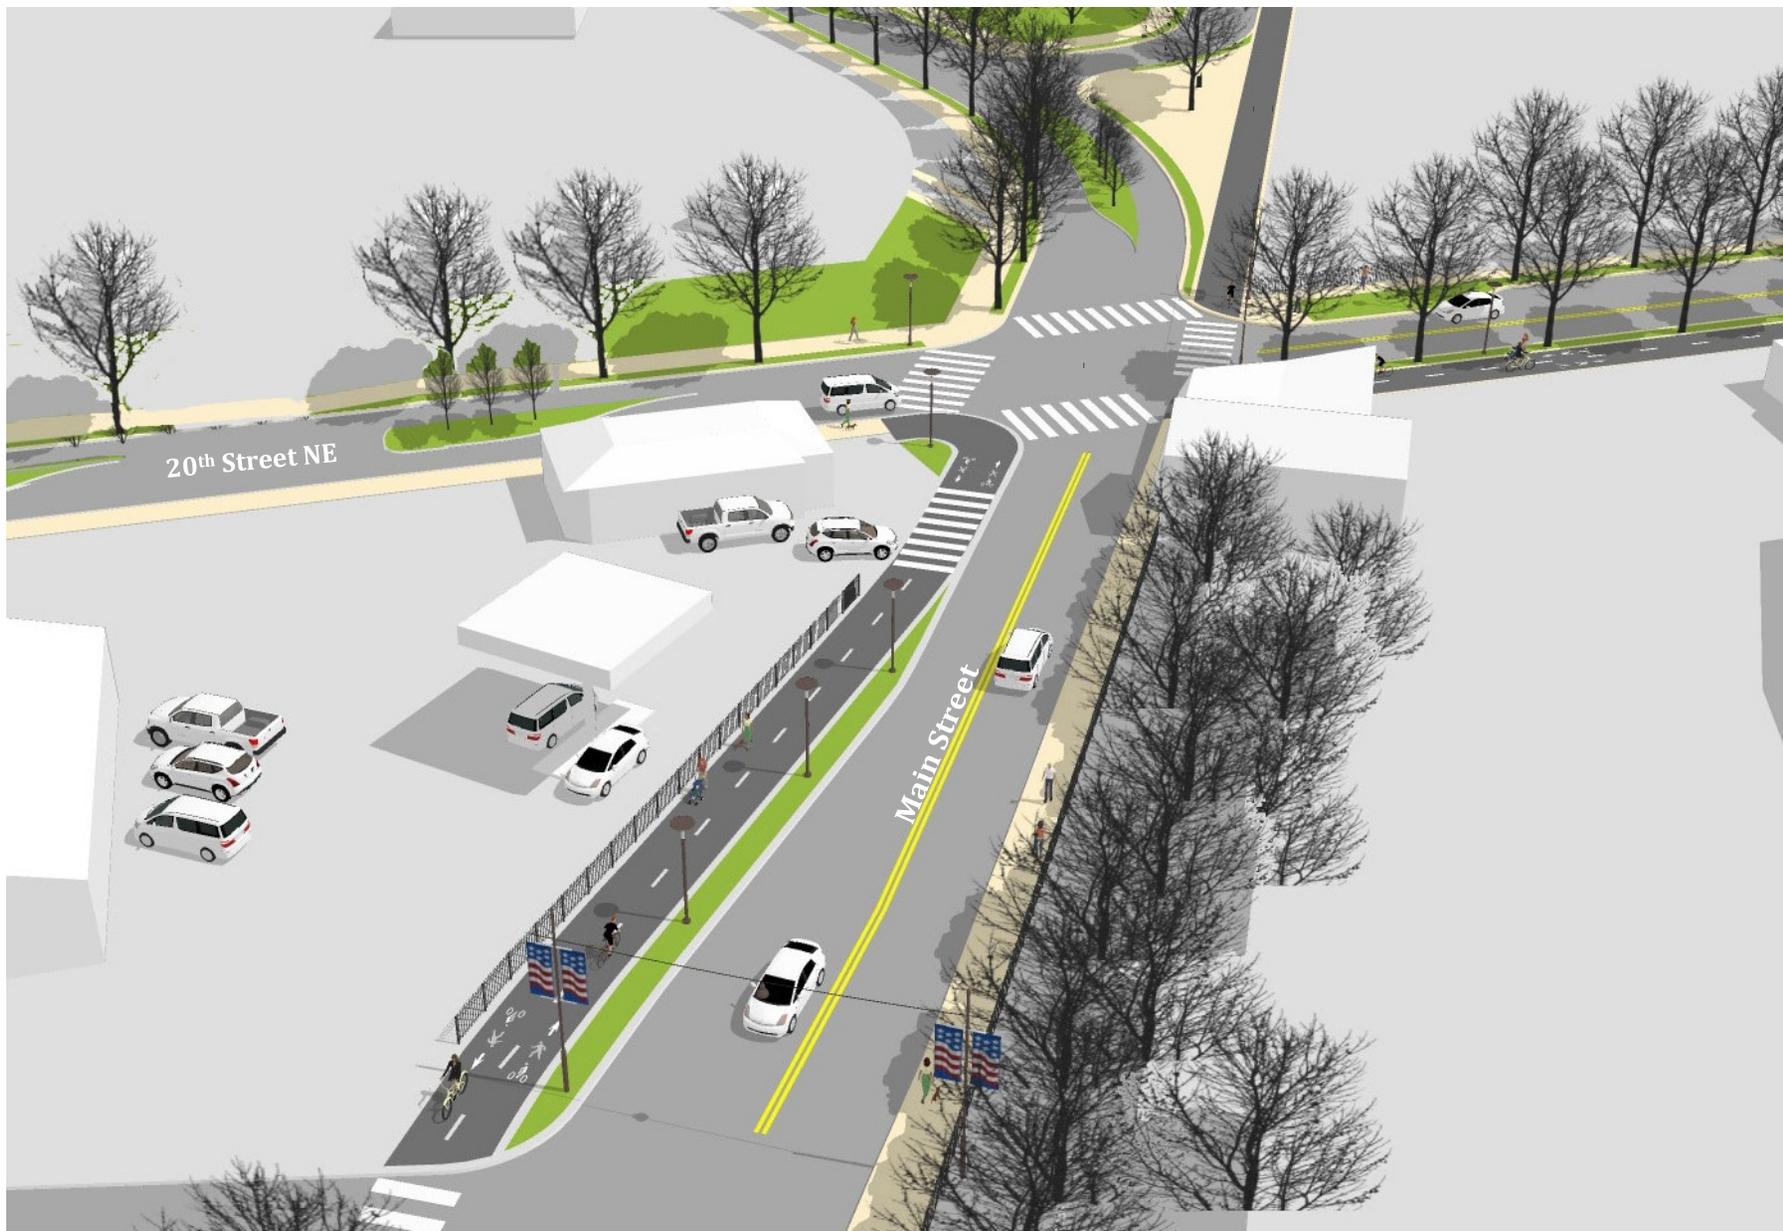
Typical Section Main Street (20th St. NE to Lakeshore Dr. NE)
